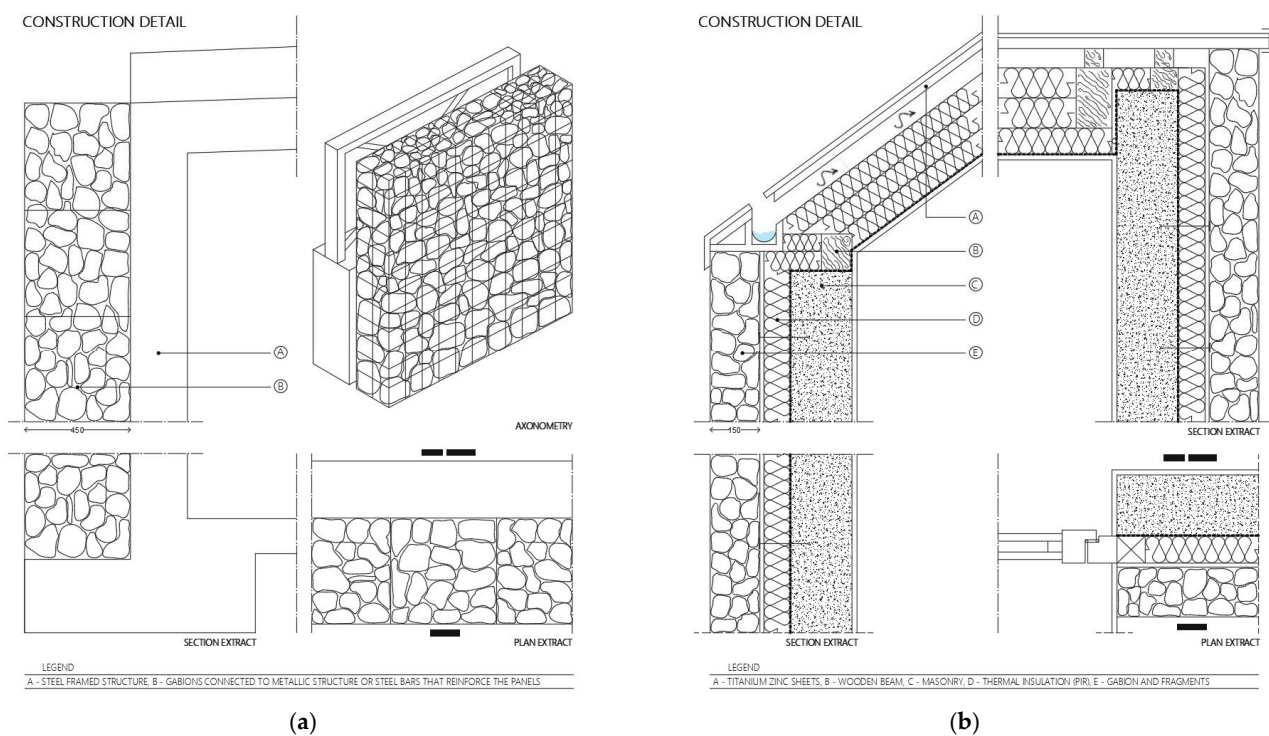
Construction details: (a) Moueix family's winery; (b) "House in the Land scape".
